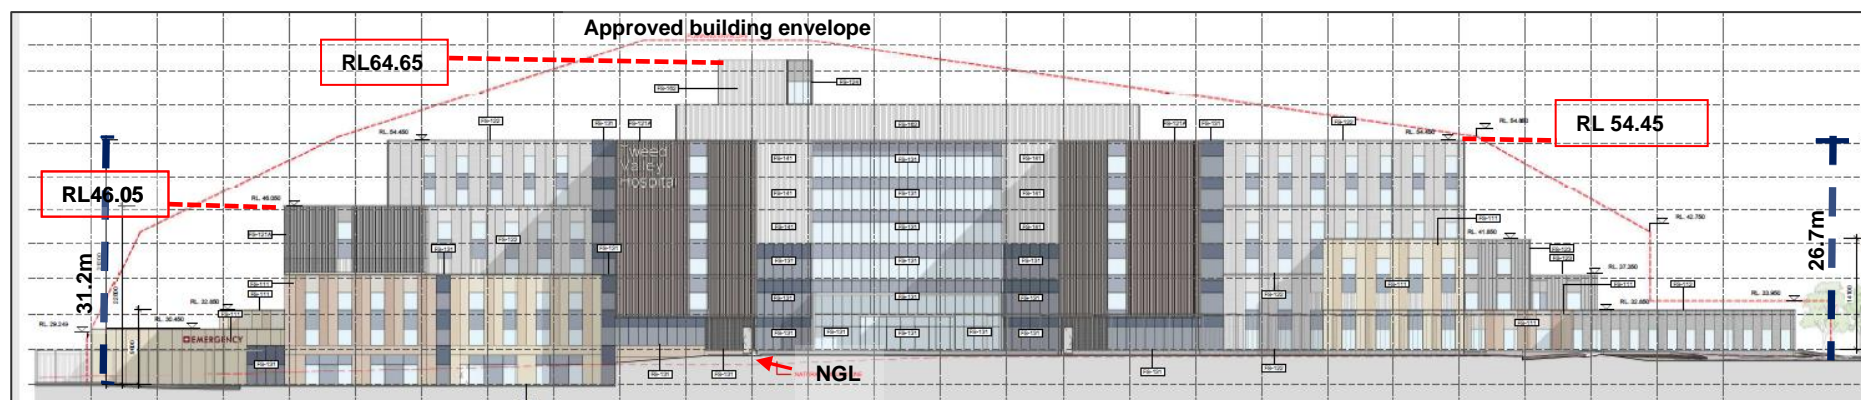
| New hospital building elevation fronting Cudgen Road (south) (Source: Applicant's RTS)
